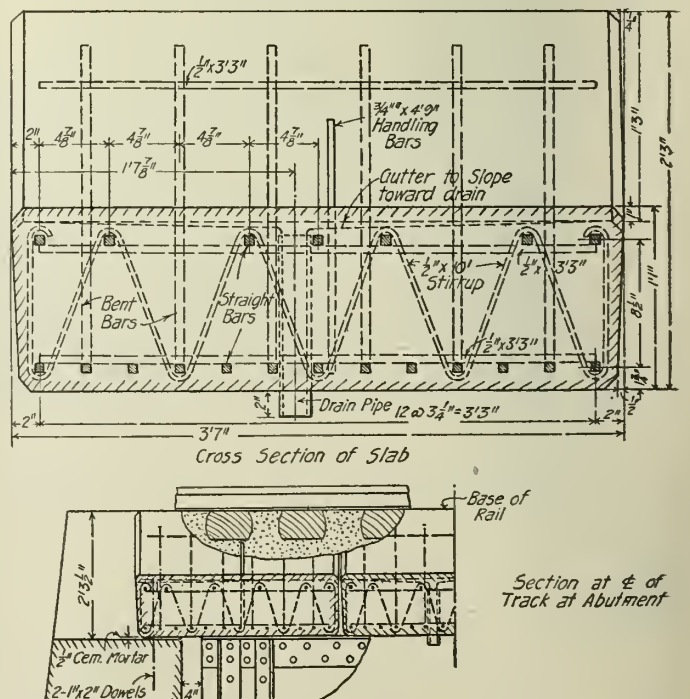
Sections of Slabs in Concrete Deck for Plate Girders, C., M. & St. P. Ry.
